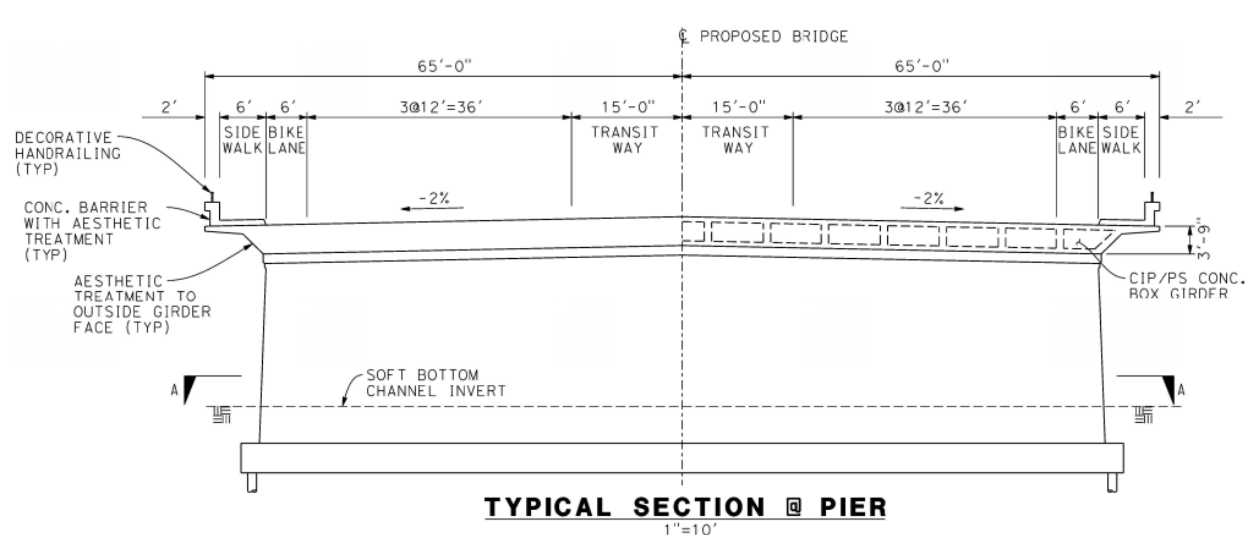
Typical Section of the Proposed Lincoln Boulevard Bridge over the Ballona Creek
